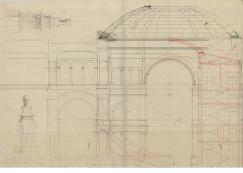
The "Galleria Oretea": elevation studies and internal sections on the octagonal hall (Damiani Archive).
